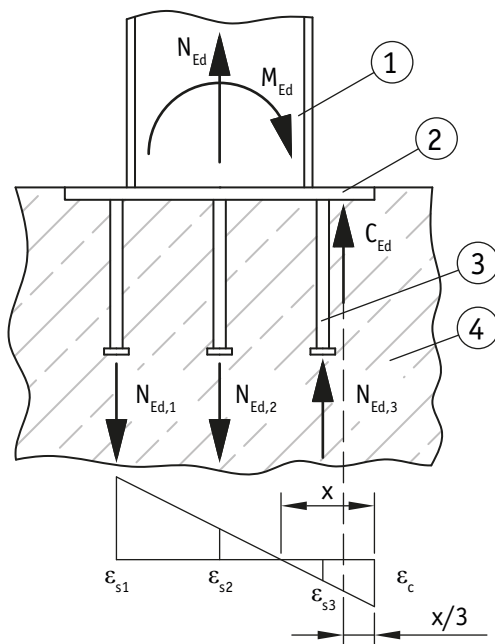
WELDA® consists of a steel plate and welded headed studs.
